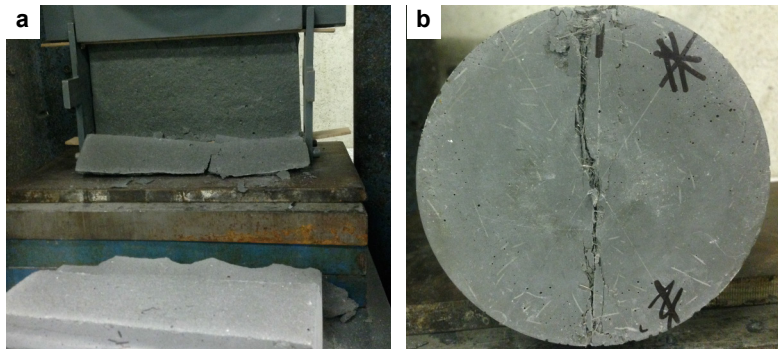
Typical failure modes for the split cylinders without and with fiber reinforcement.
